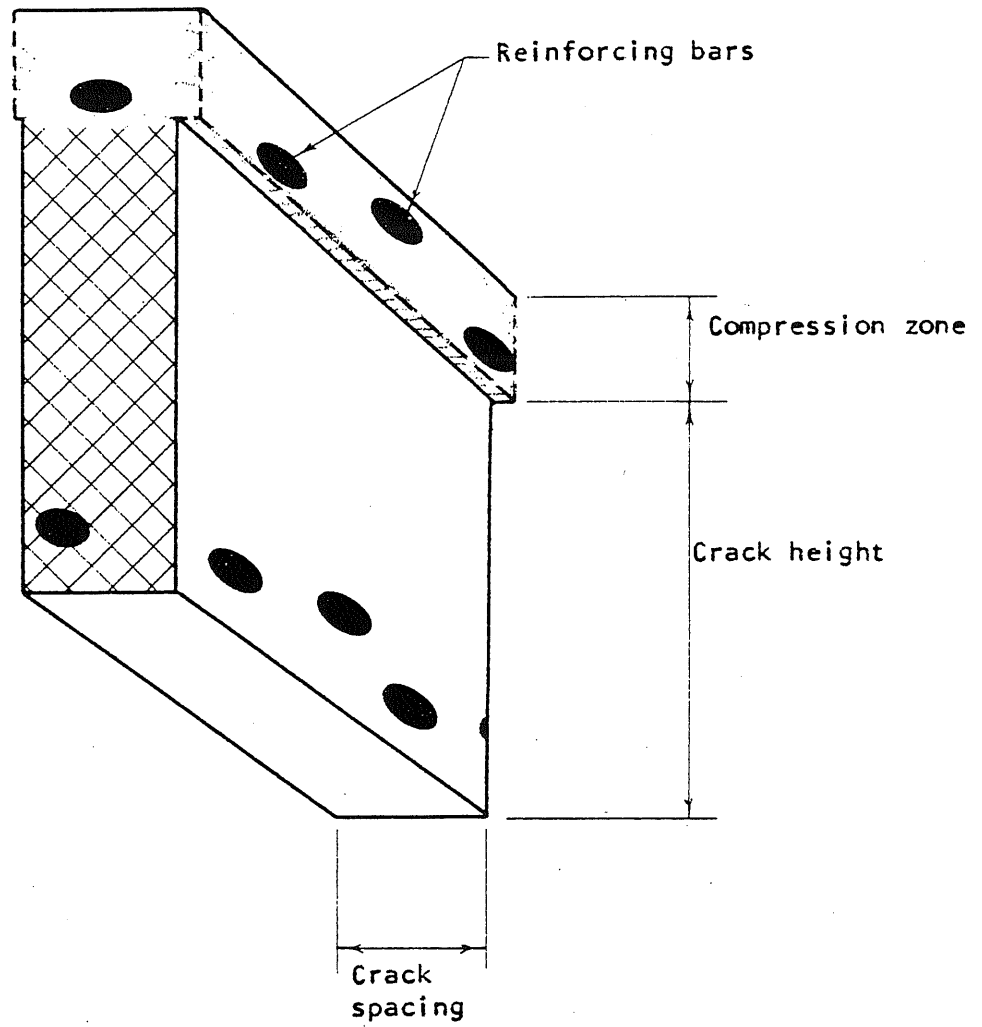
A CUT-OUT SECTION OF A REINFORCED CONCRETE SLAB ELEMENT
